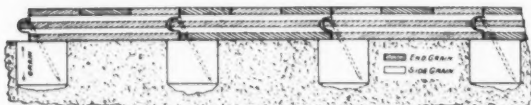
ANCHORING PLYWOOD FLOORS TO CONCRETE. An efficient method of attaching plywood floor to concrete for better mechanical bond. Saves approximately 3 in. vertical space.
